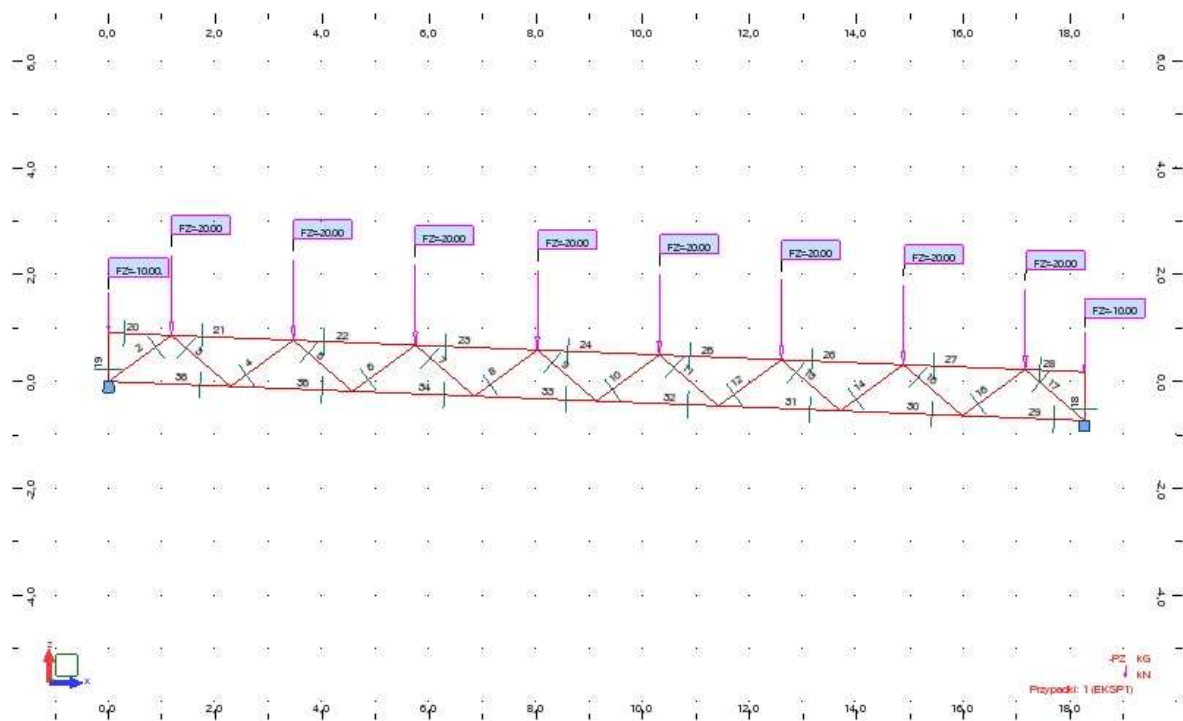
Truss with changes shape and IPN cross-sections.
